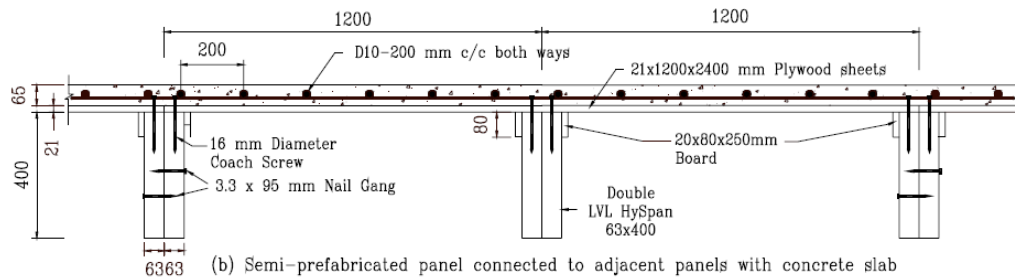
TCC (Timber-Concrete Composite), UC Arrangement
